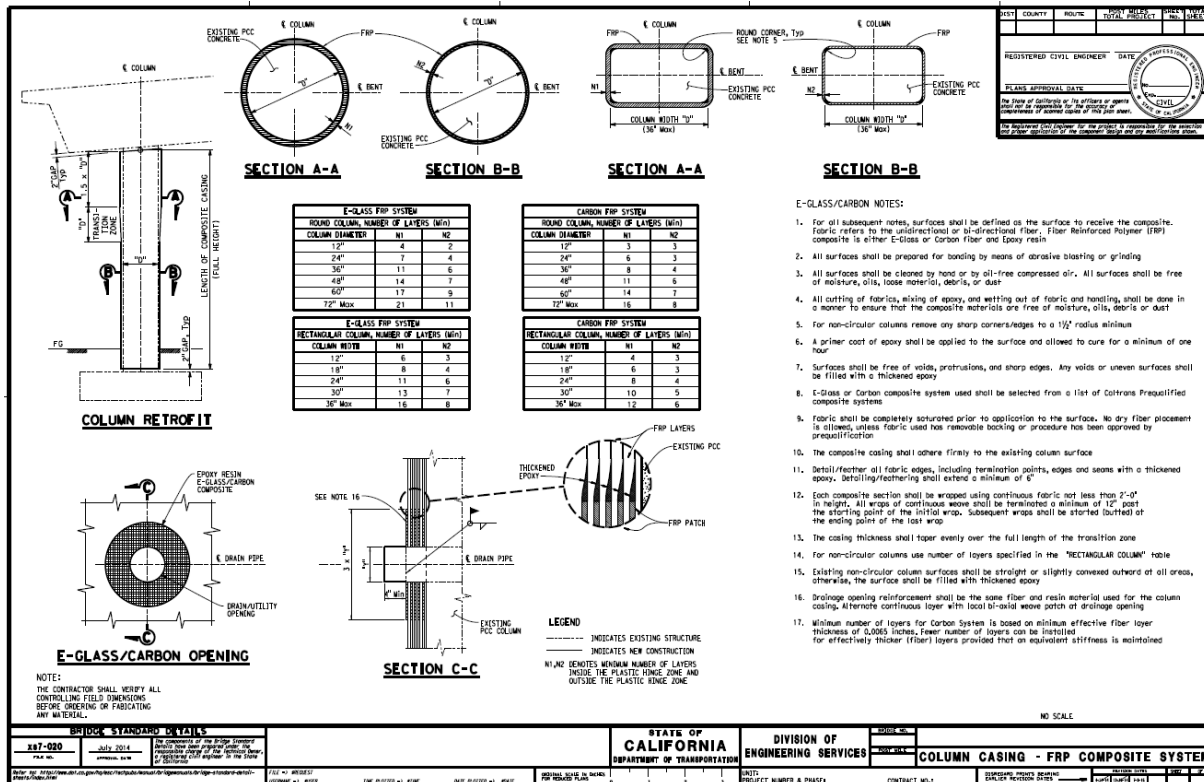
Bridge Standard Plan Sheet (XS7-020) for Bridge Column Retrofit using FRP
